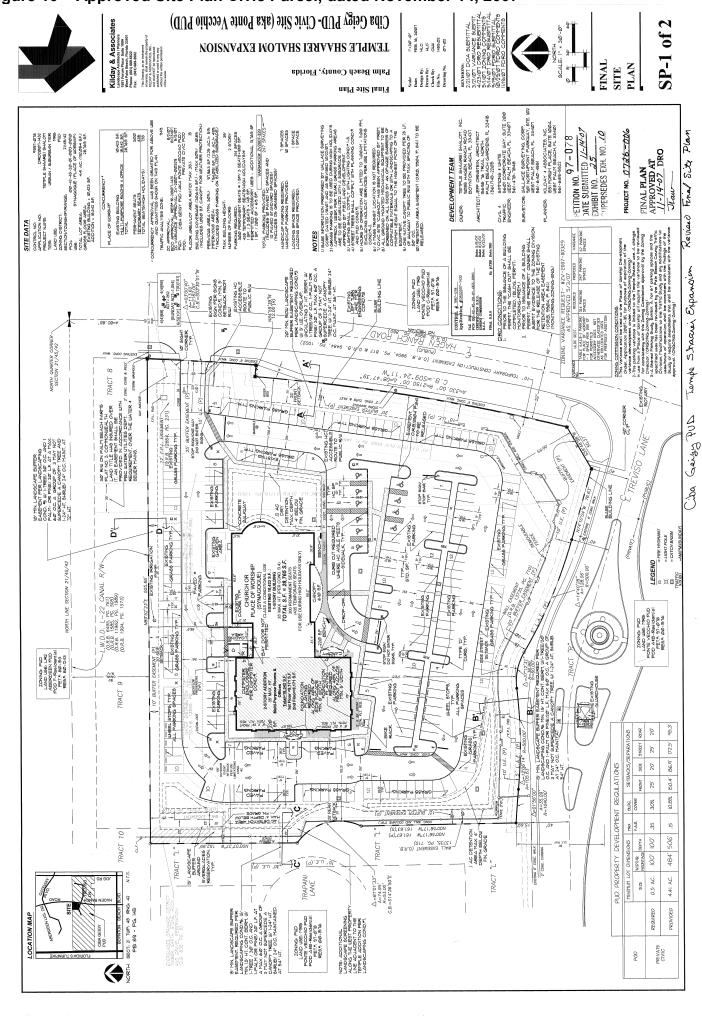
Approved Site Plan Civic Parcel, dated November 14, 2007
